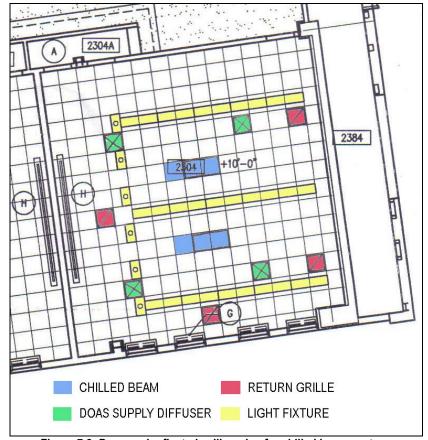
Proposed reflected ceiling plan for chilled beam system.
